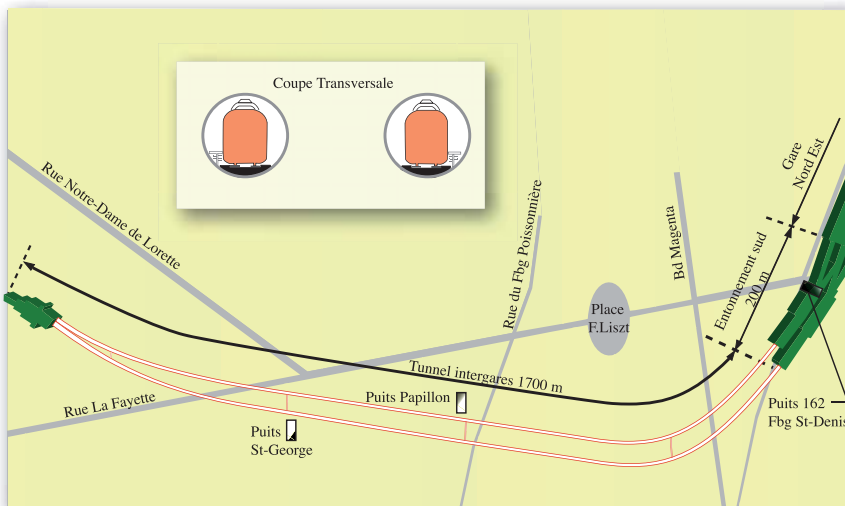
A plan view and a section of the EOLE twin-tunnel.
